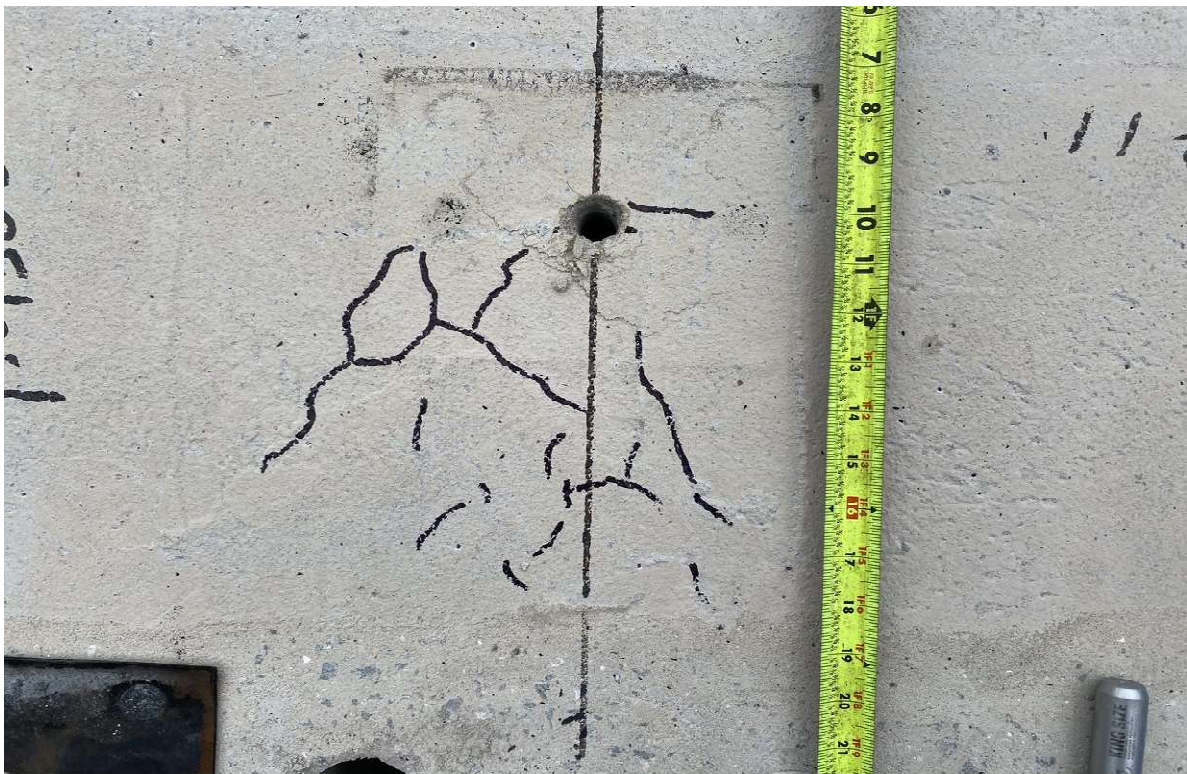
P-SE1c-1 specimen concrete after cyclic loading
